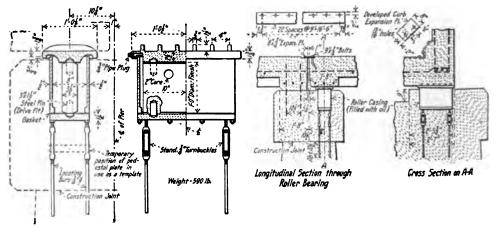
Segmental Bearings for Concrete Girders. Michigan State Highway Department.
